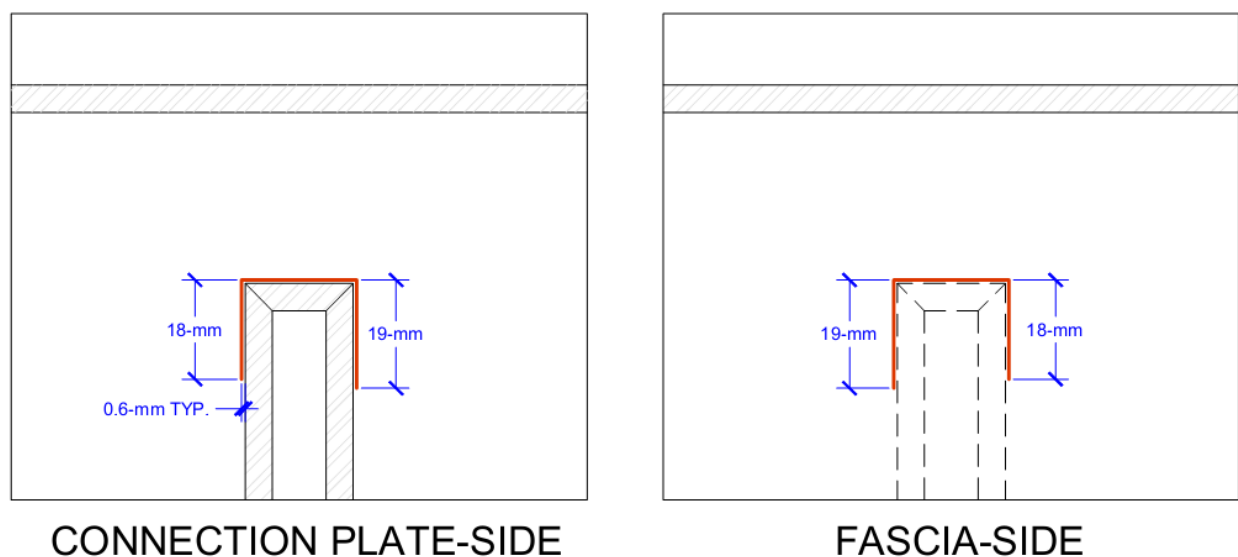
“Simple” modeling approach for cracks observed after 150,000 cycles on north girder
